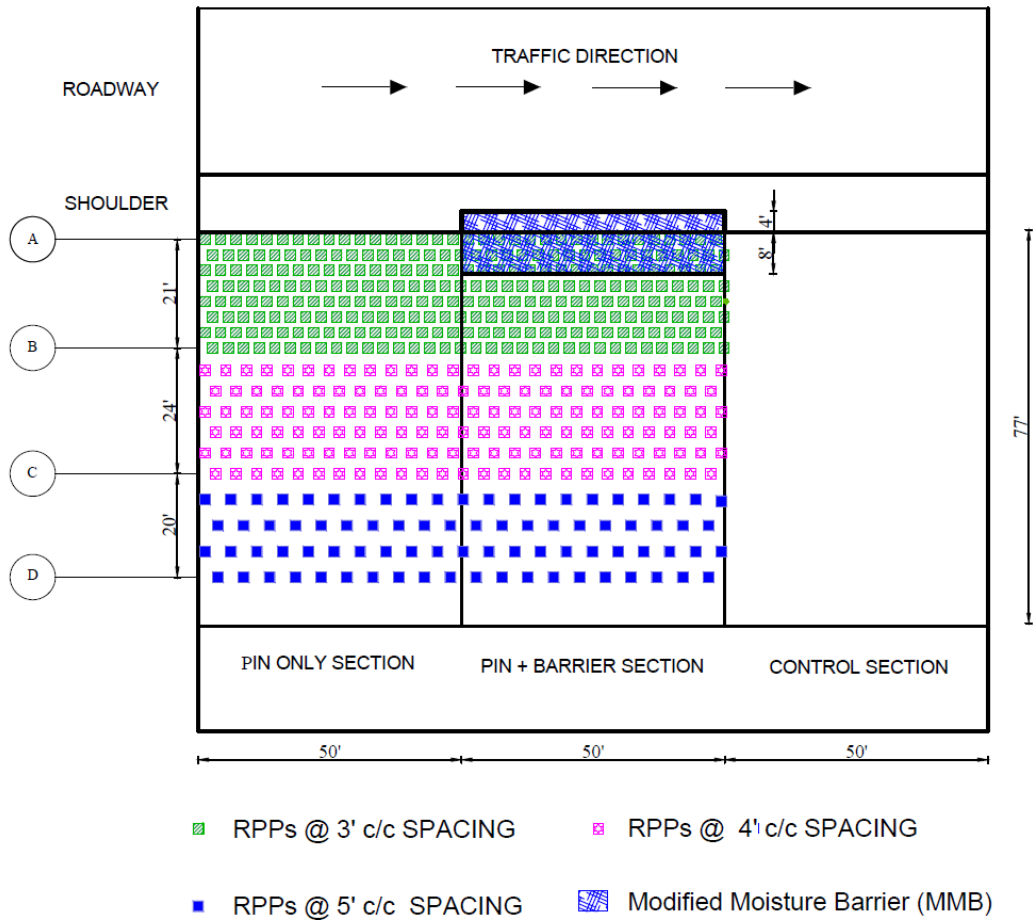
Plan view of test sections: control, pin-only, and pin-plus barrier.
